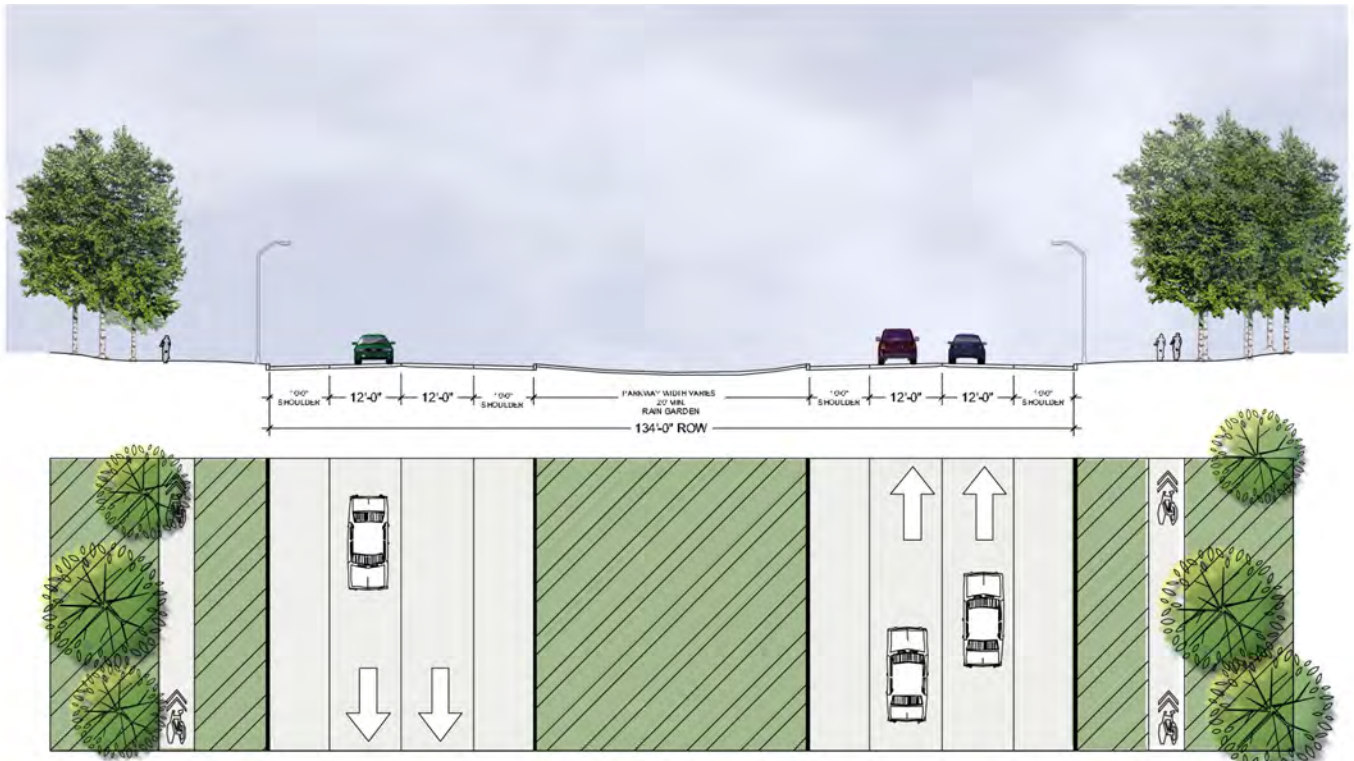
Section, Parkway: This section for the parkway applies to the higher speed portion of Manchester Road, between Old State and Route 109. The recommended section retains the basics of the design of this road. It maintains bike lanes as separated facilities on either side of the road. Importantly, though, the section calls for additional tree plantings and landscaping on either side to improve the aesthetic quality of this portion of the corridor.
